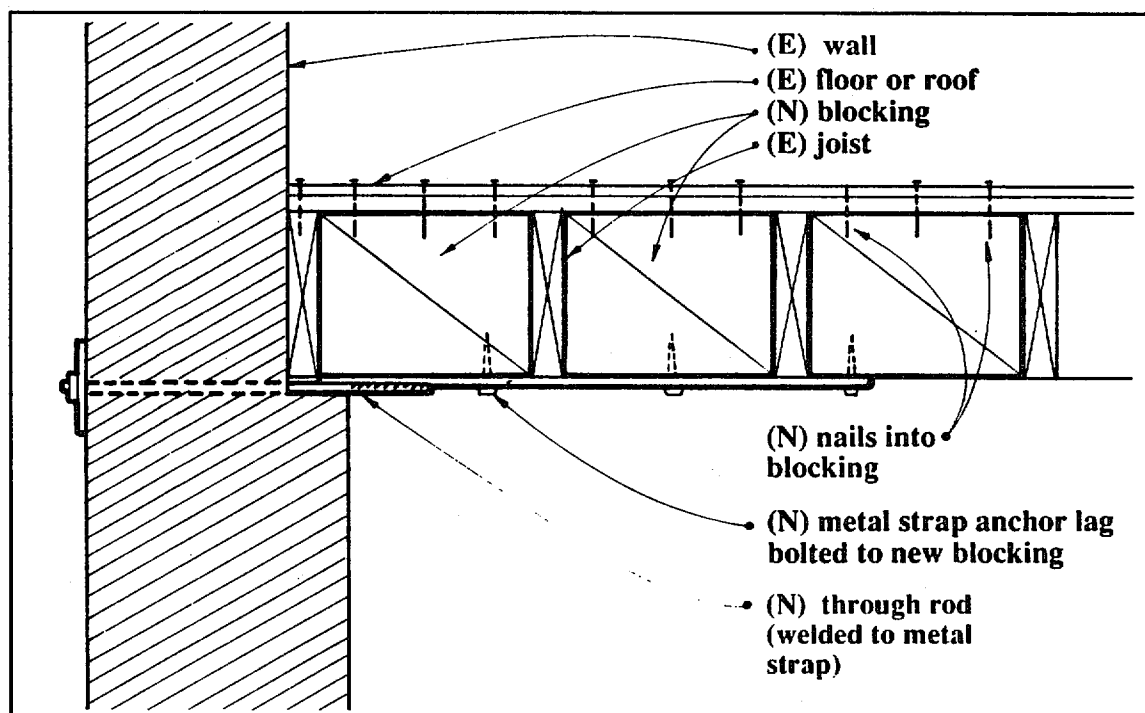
Strengthening out-of-plane connections of a wood diaphragm.
